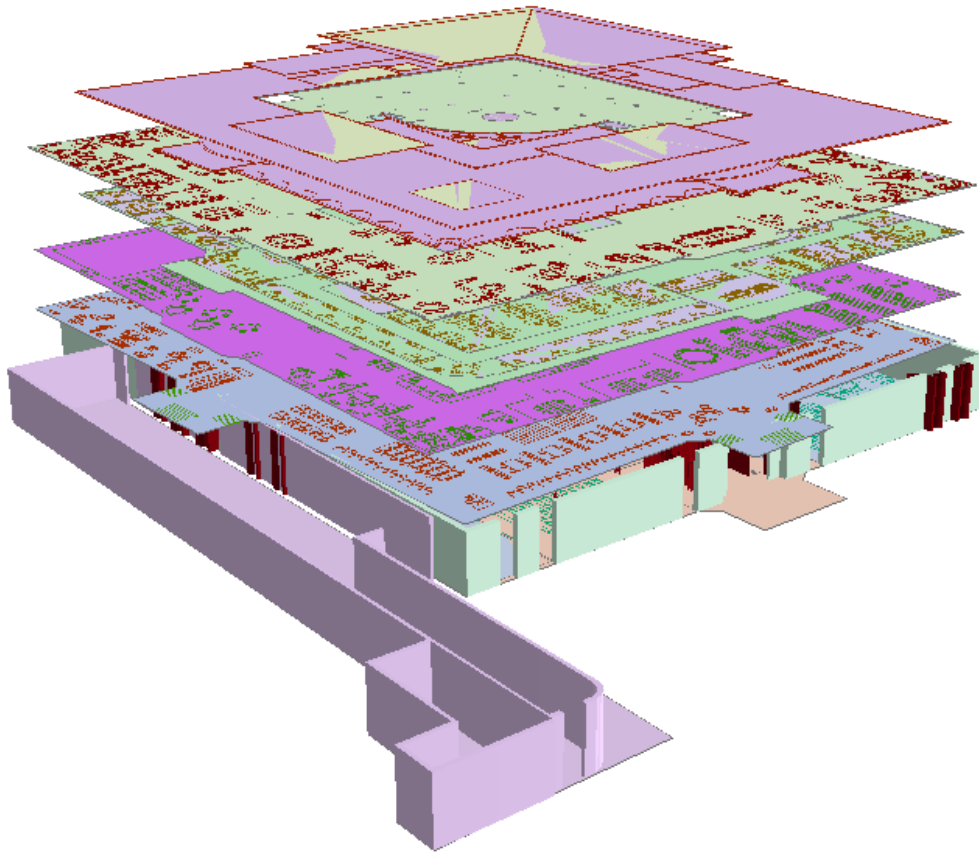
6 A 3D model of the underground mine at the CM building CM Building (source: Author)
